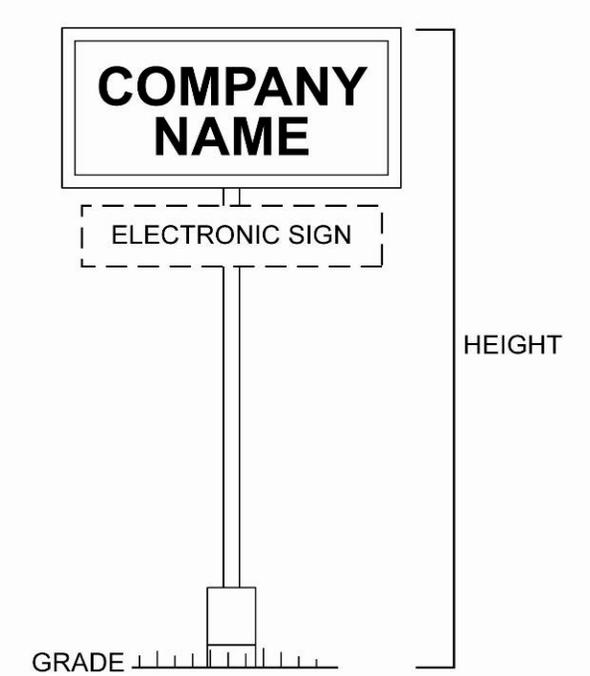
Sign Configuration Illustrations and Photo Examples
